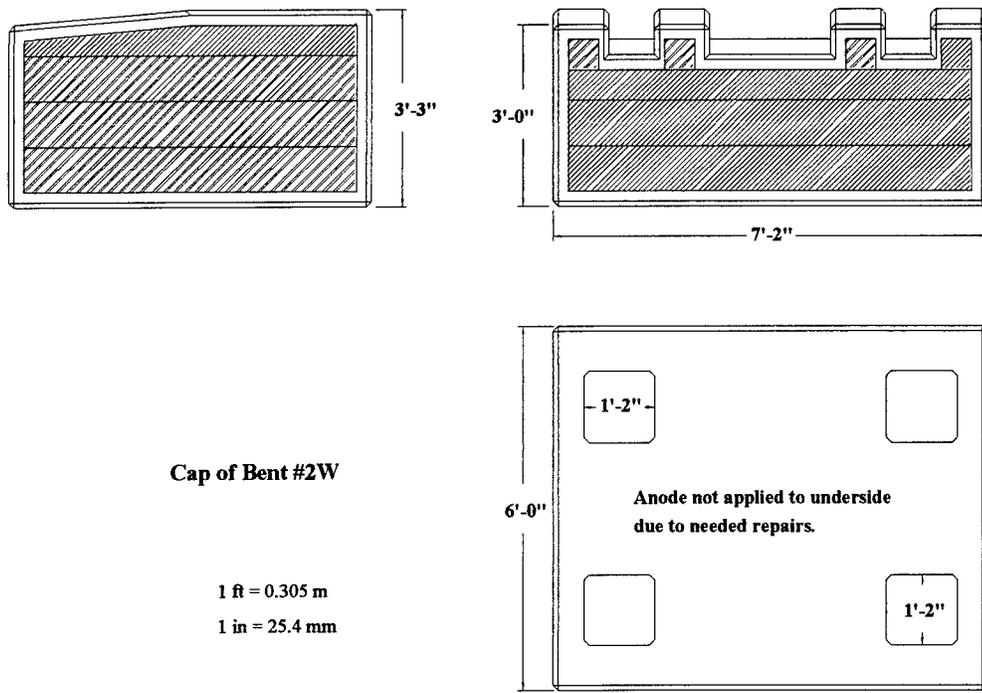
Layout of zinc/hydrogel on pile cap of bent #2
